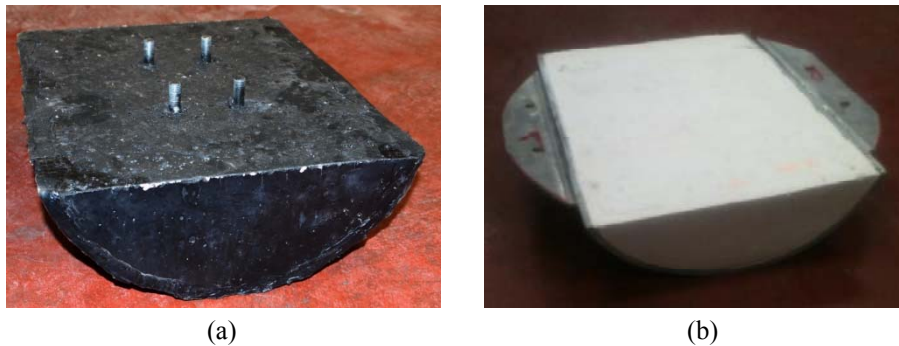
(a) the concrete cylindrical test object and (b) the plaster one
